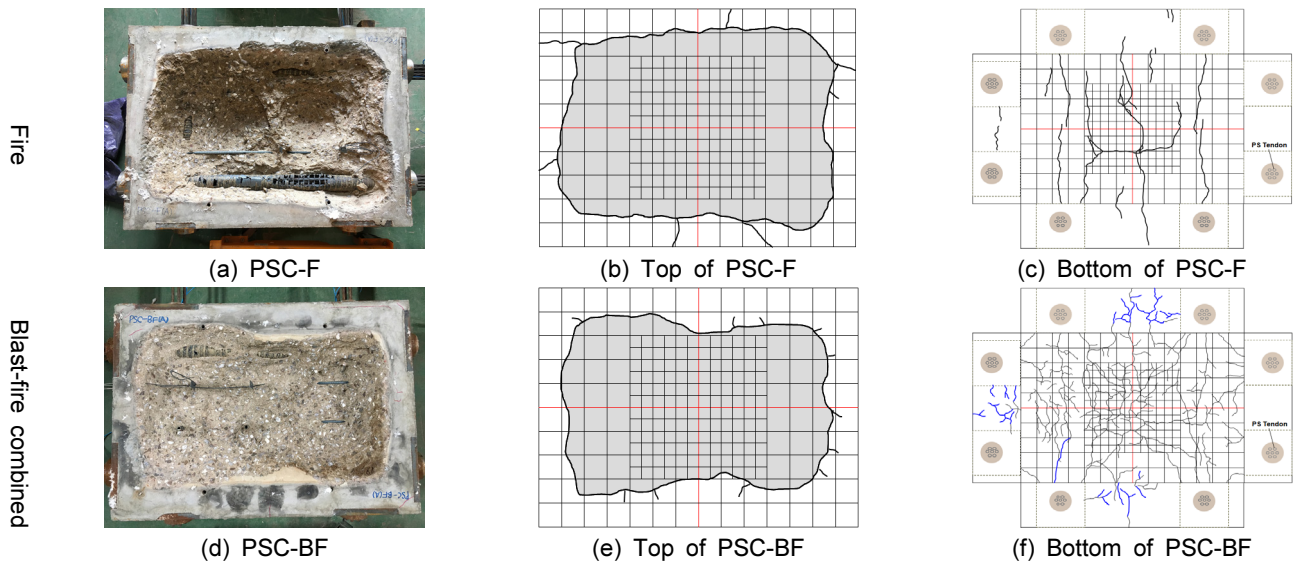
Damaged surface and crack profile of fire and blast-fire tested PSC panel
